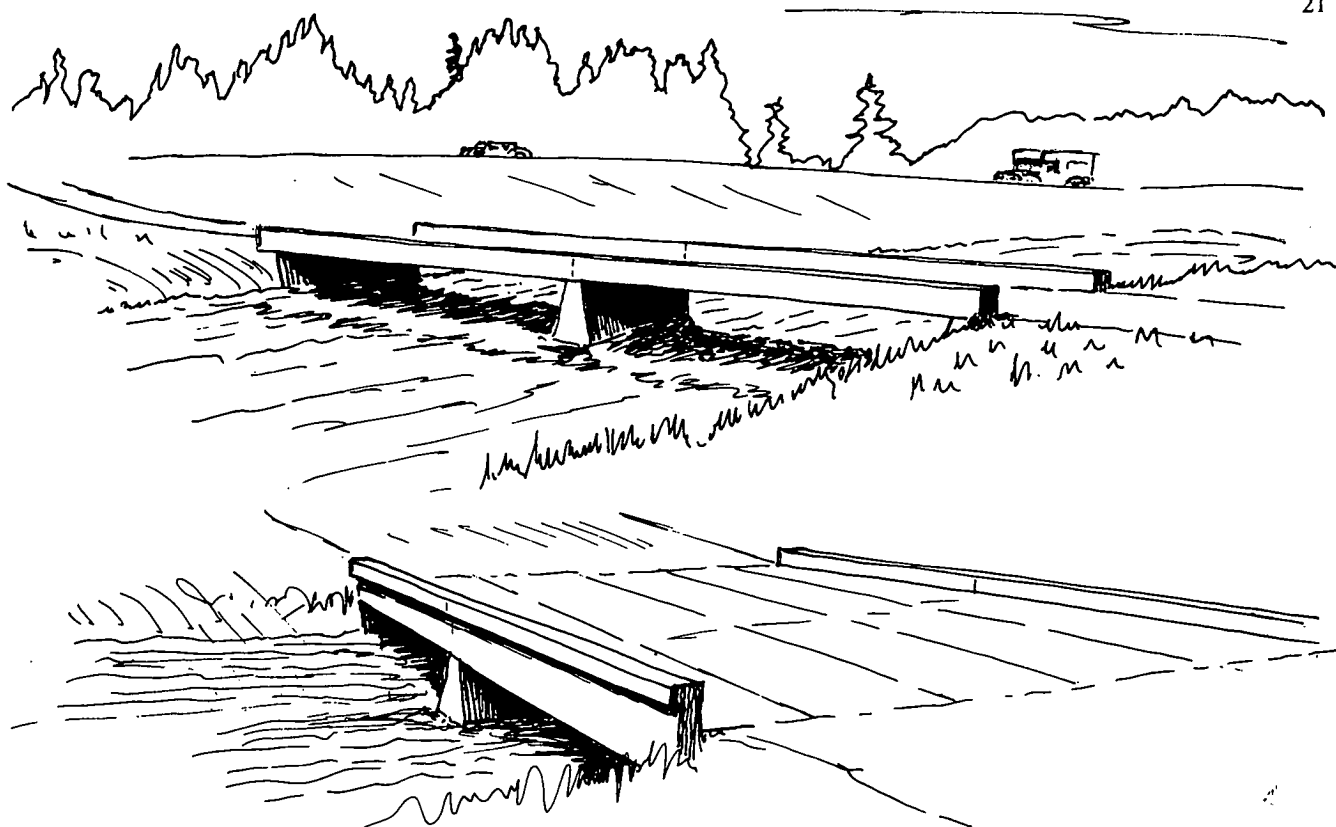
Simple two-span precast concrete bridge in Yellowstone National Park, a complete superstructure with 10 precast sections.
